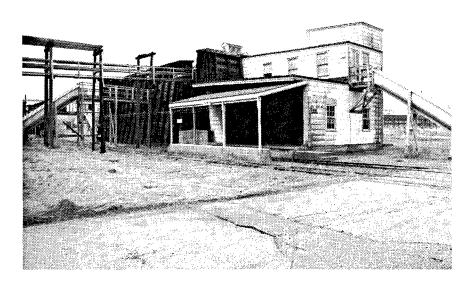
Building 6702-4: Pre-Mix House behind a double riveted barricade. Exterior walls are shingled with cement asbestos and underneath composition shingles are rolled roofing. Interior walls and ceiling are coated with paraffin impregnated transite, and the floors covered with lead sheets.
